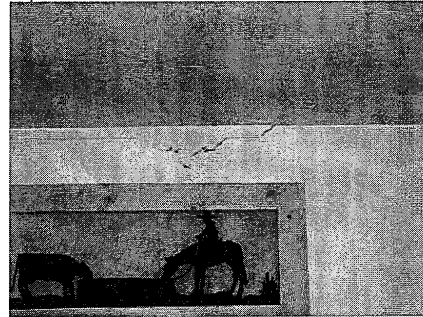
Dry wall cracking (Photo: Chadwell).
